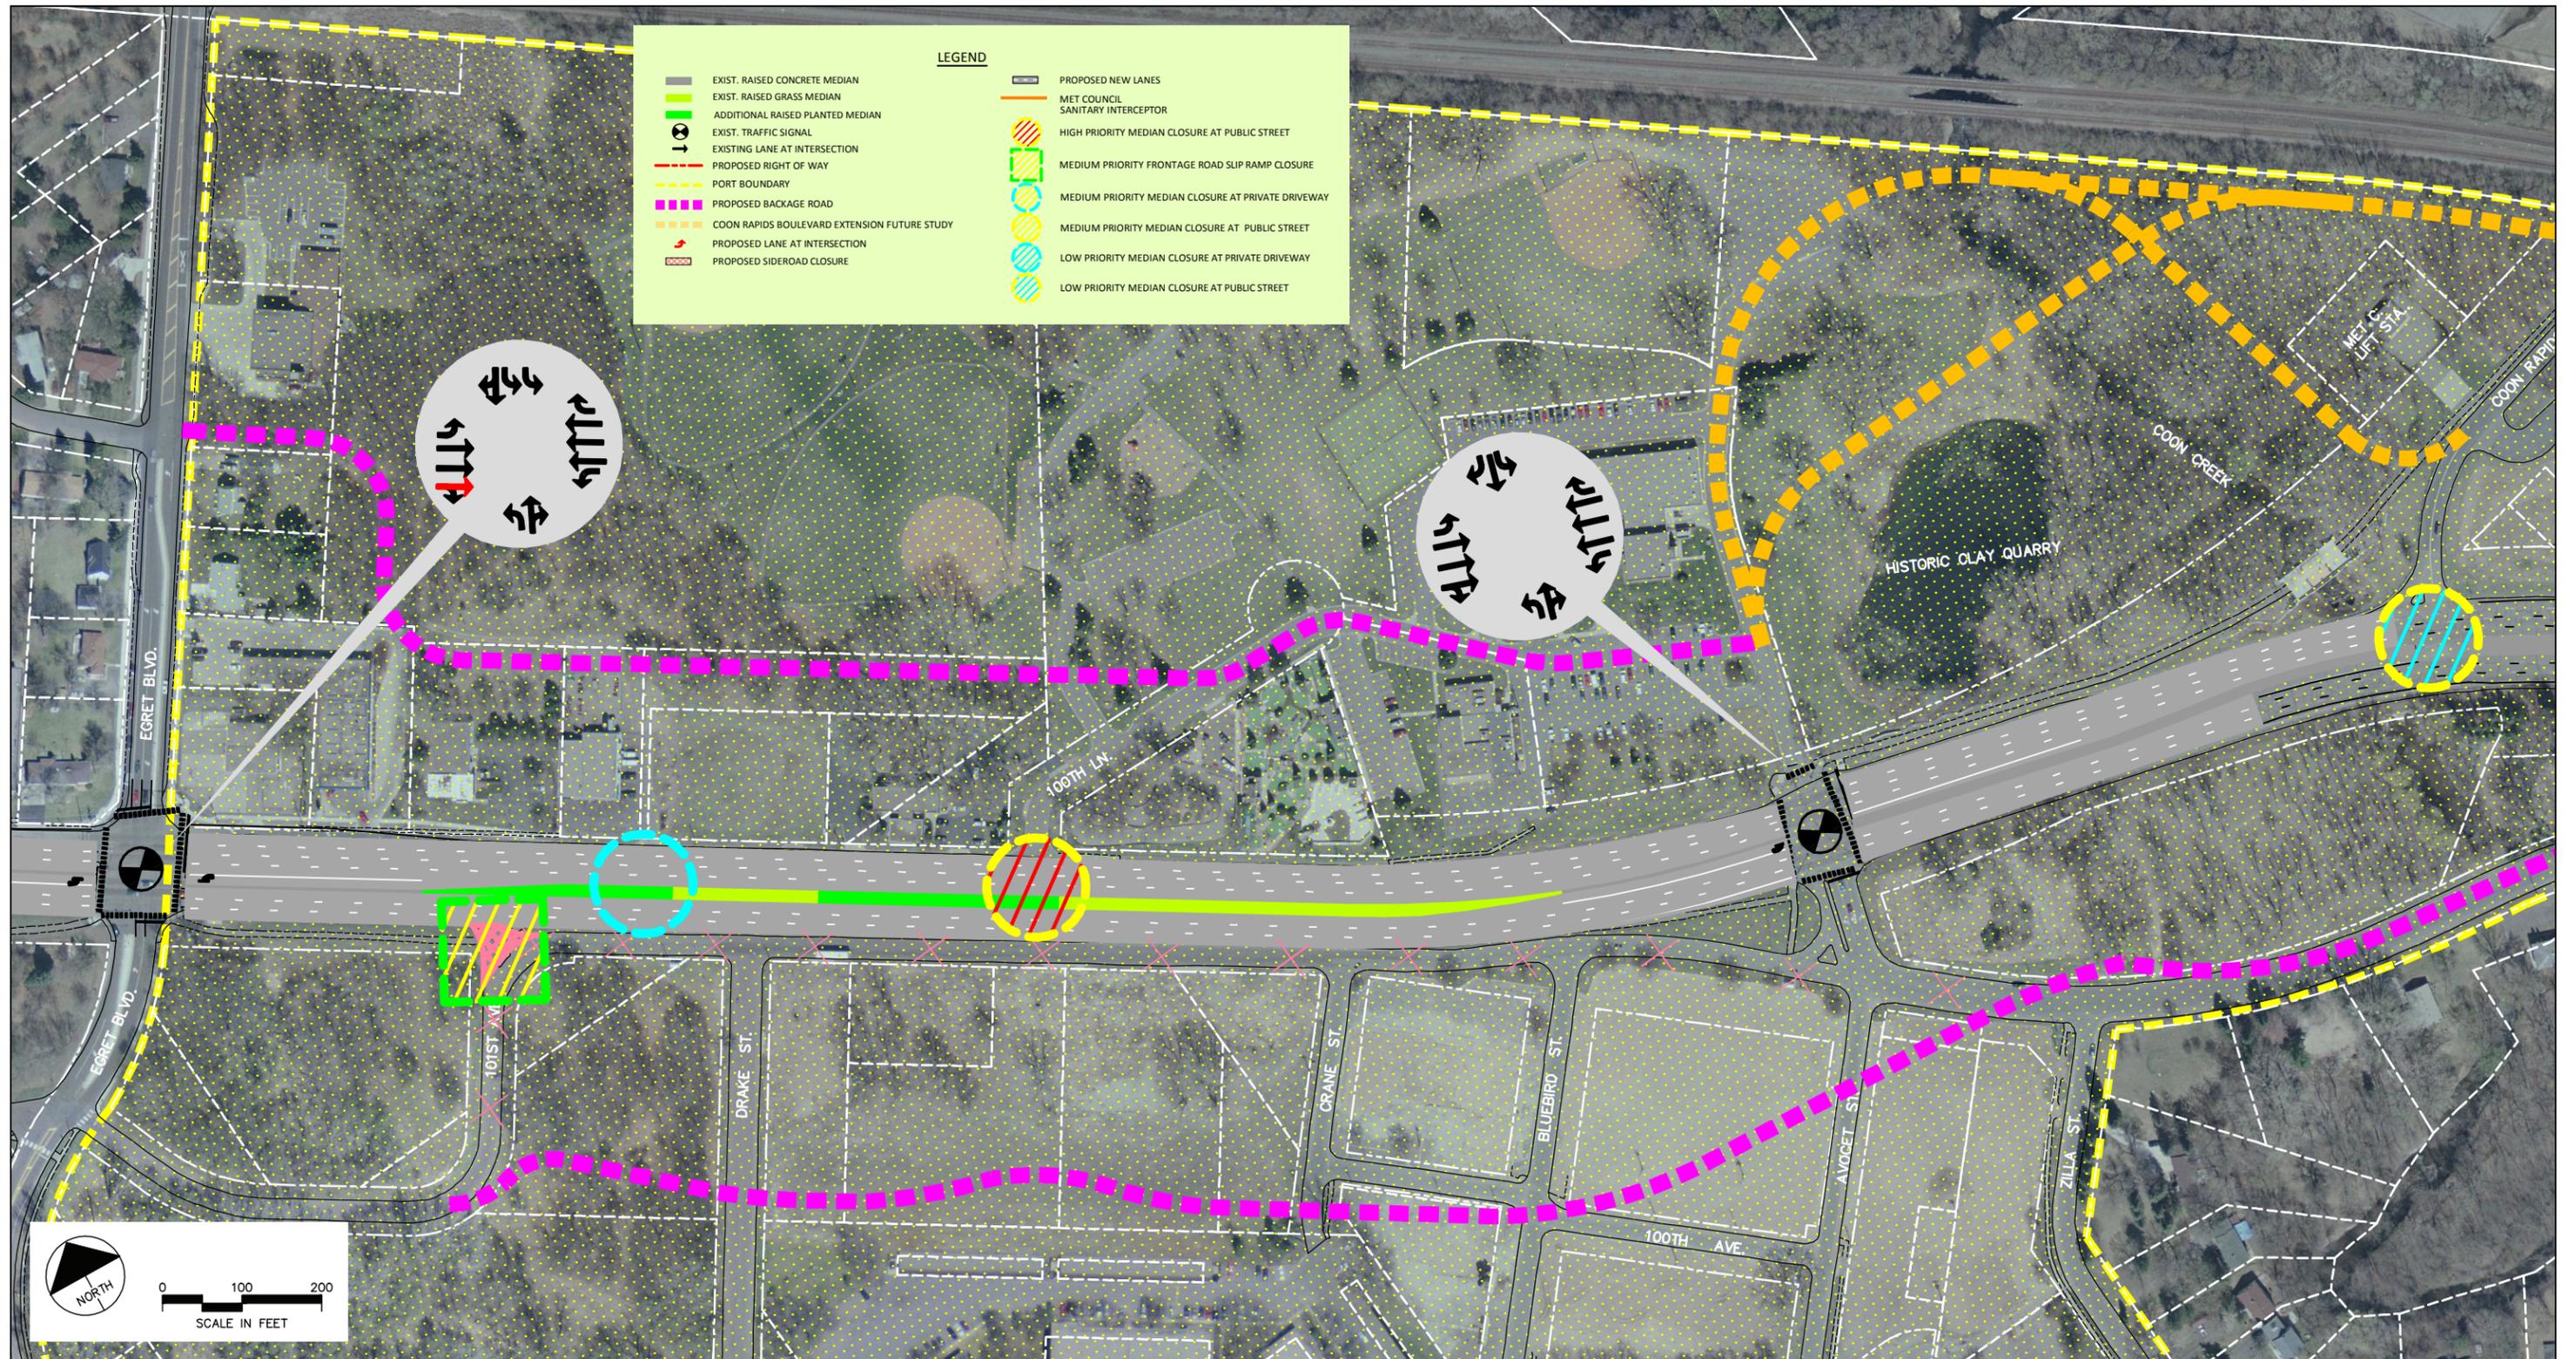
Proposed Roadway Recommendations Detail (10 of 15)
